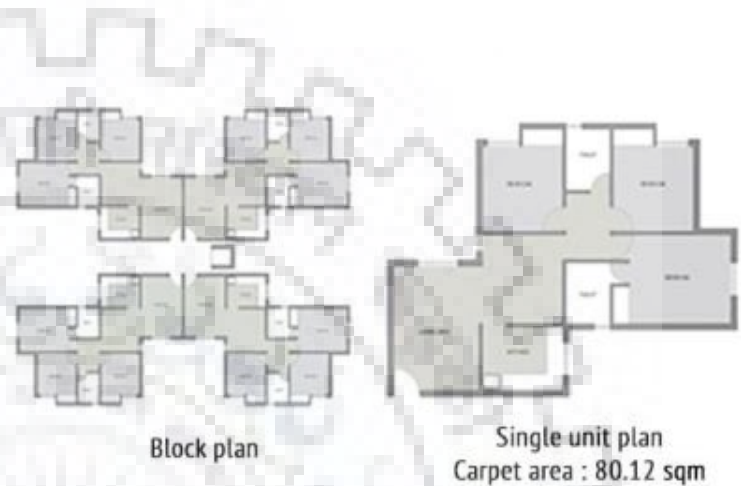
Building plans for building energy modelling. Source: [9] Global building performance network (2014).
